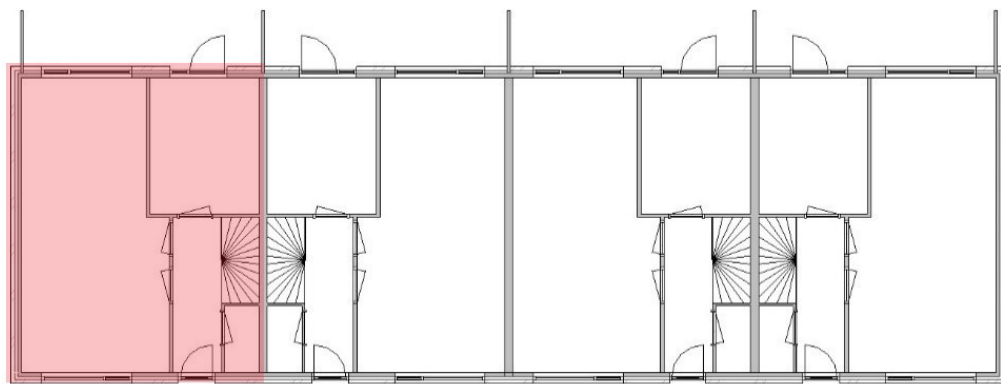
Floorplan of the dwellings (analysed dwelling highlighted in red)
